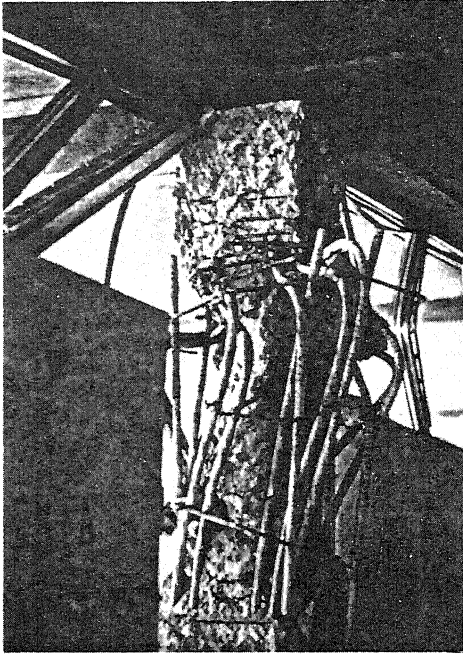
Column failure in Classroom Building of Agricultural University, Lima, Peru, in October 1974. Note beneficial performance from closely spaced ties at top of column.
